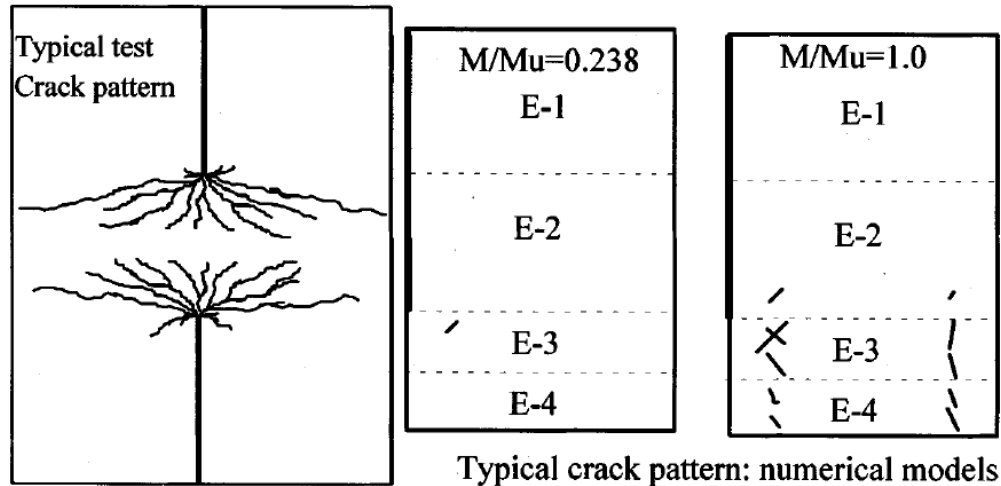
Crack pattern and failure of coupling slabs (Hossain 2003)
